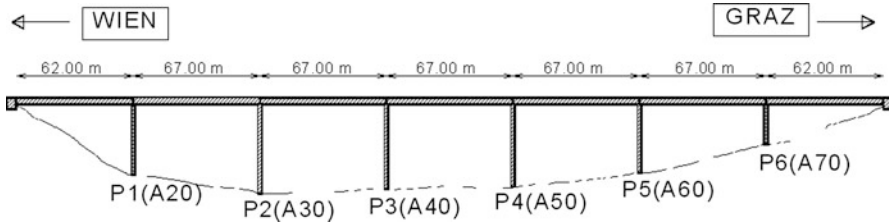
Layout of Talübergang Warth bridge and pier nomenclature
